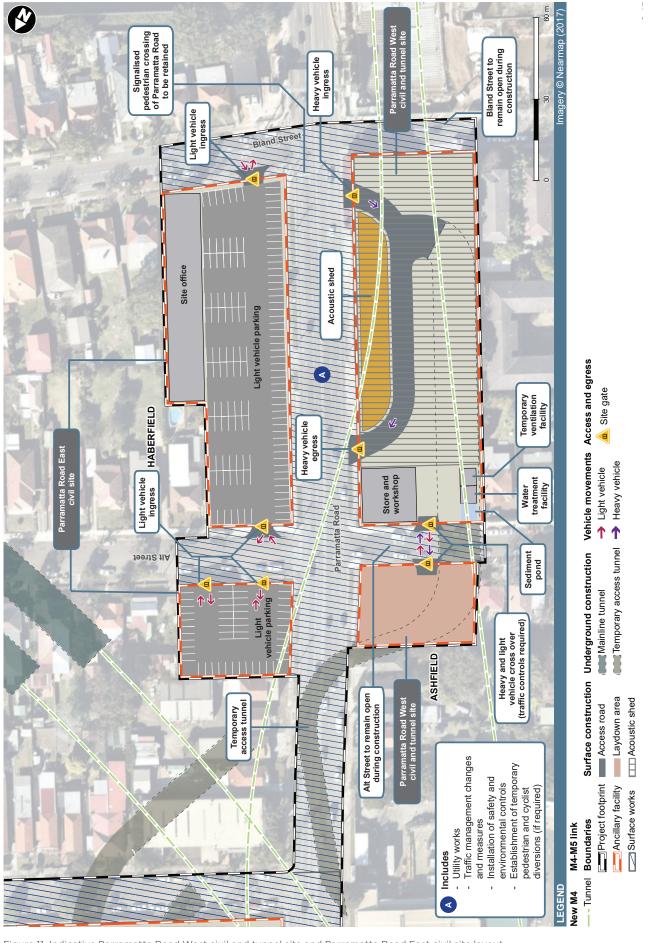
Indicative Parramatta Road West civil and tunnel site and Parramatta Road East civil site layout
